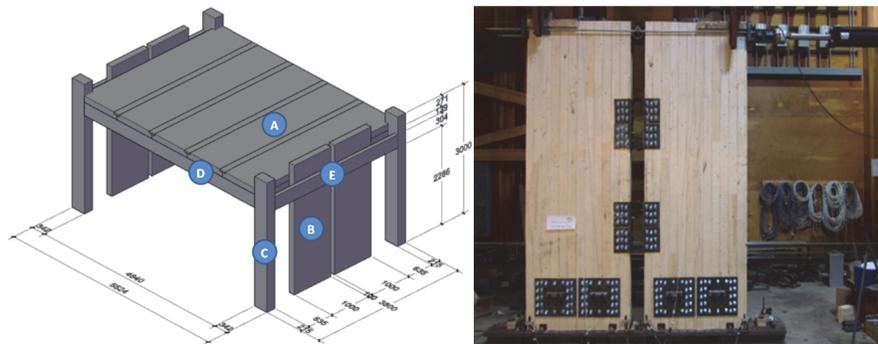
Single-story post-tensioned timber building model (left) and coupled wall specimen (right).
